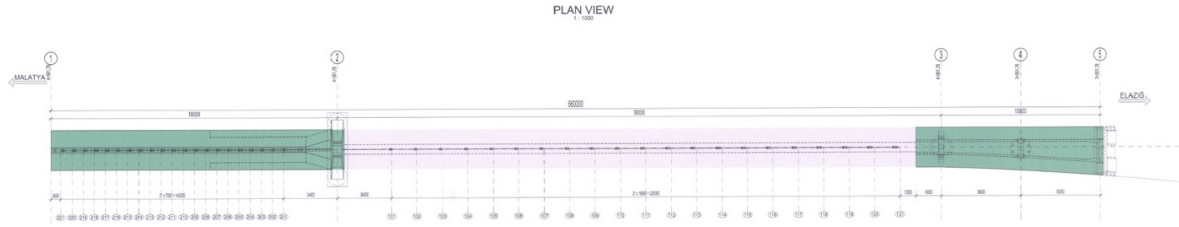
Cable arrangement plan view of New Kömürhan Bridge.
